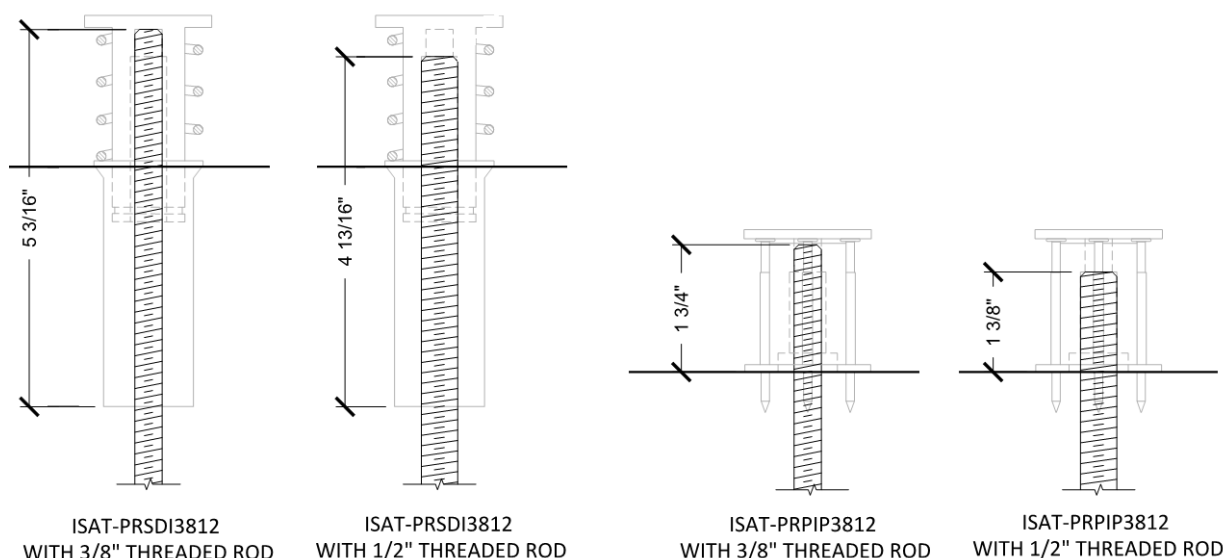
REQUIRED THREADED ROD (ATR) ENGAGEMENT IN PUSH ROD INSERTS FOR PROPER INSTALATION
